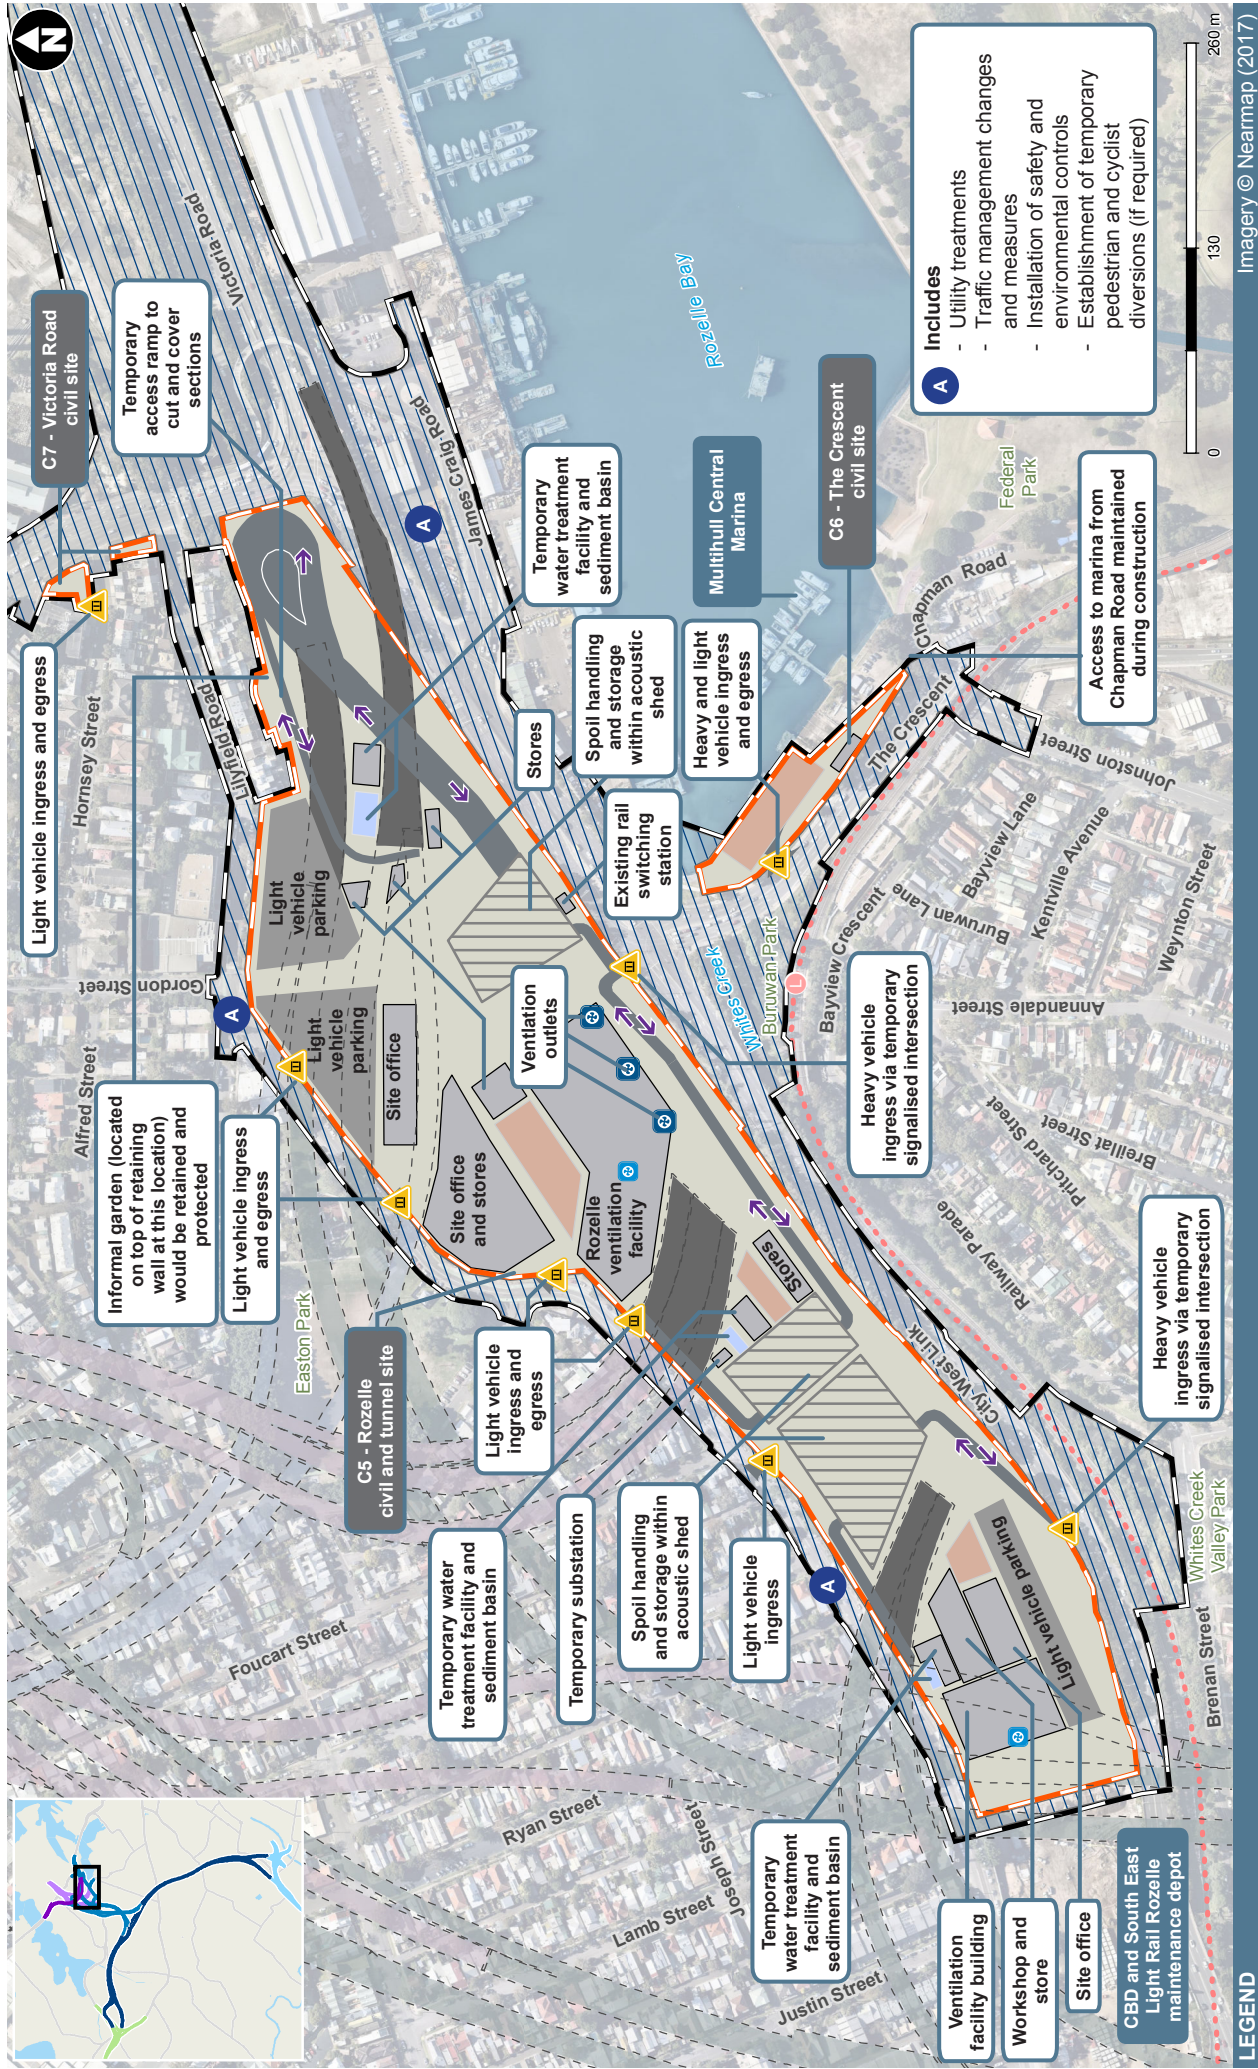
Indicative Rozelle civil and tunnel site, The Crescent civil site and Victoria Road civil site (C5, C6 and C7) layout
